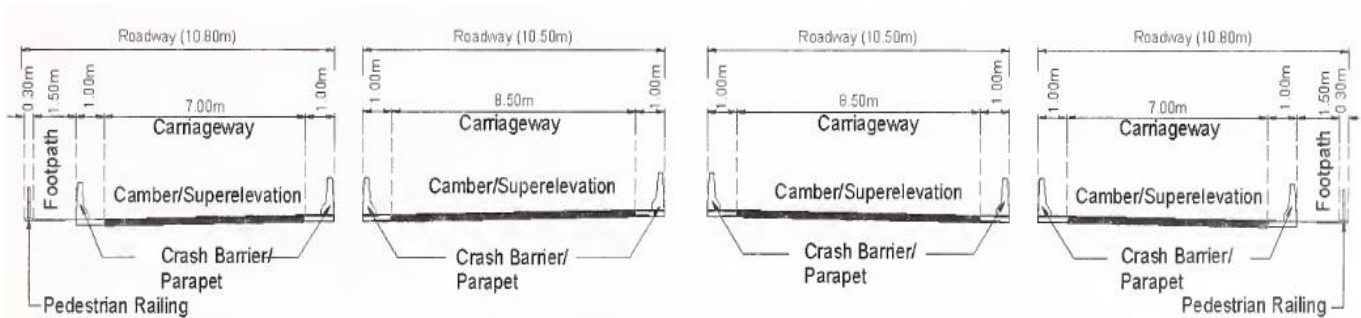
Cross Section of Bridge at Deck Level – with Road Bridges and Footpath
